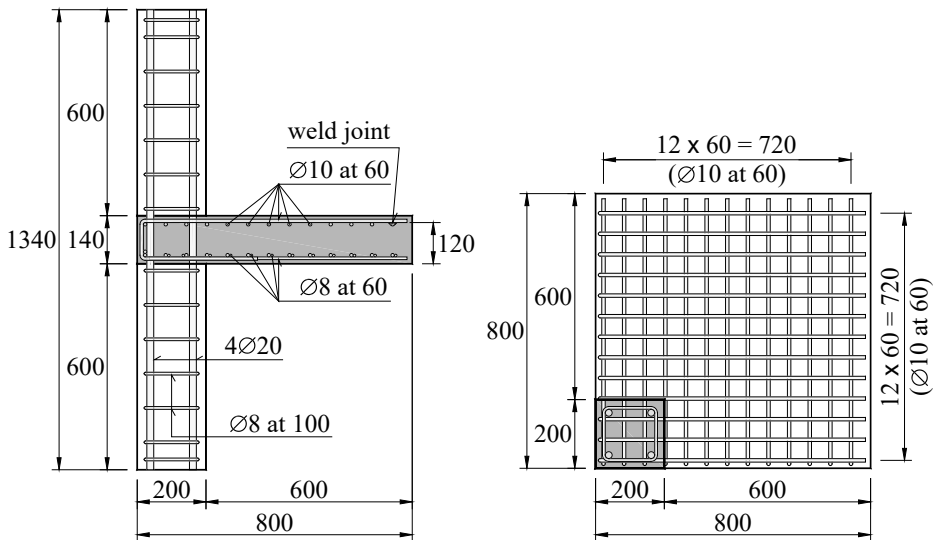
View of the reinforcement of the test specimens. *Source:* own study
